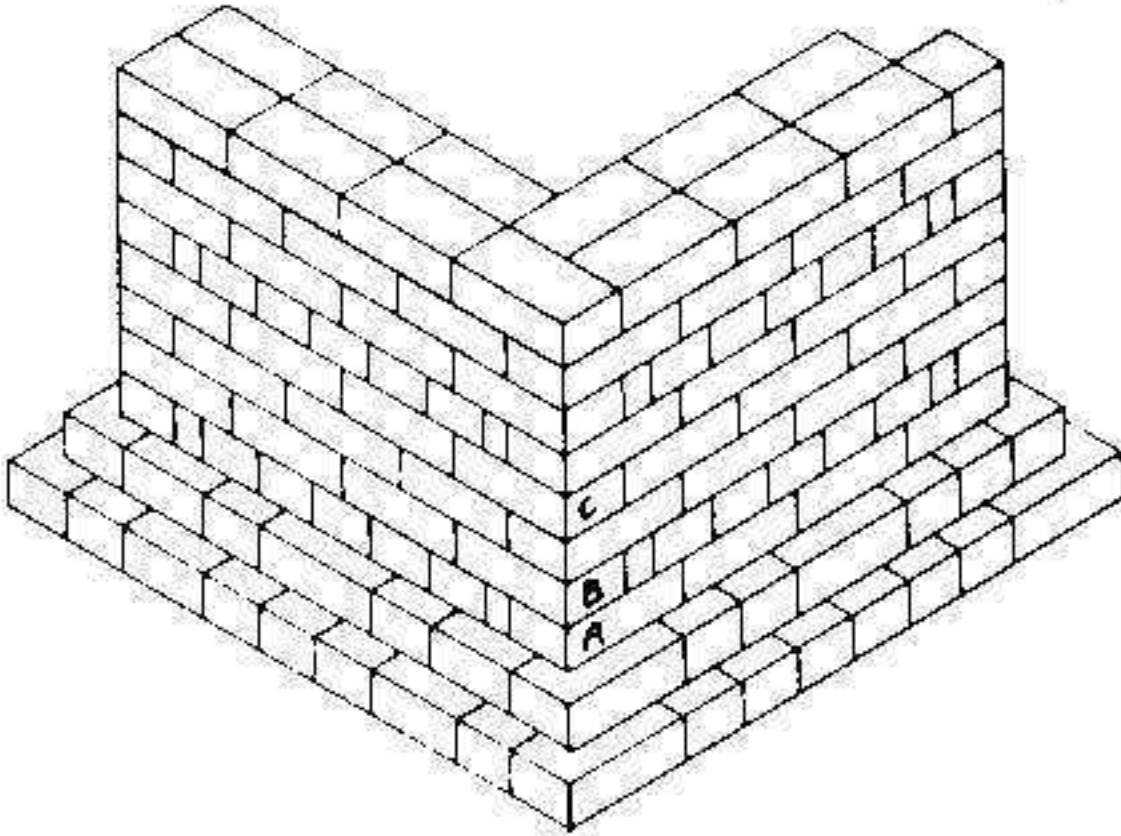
A: Critical Structural Details - Full Brick Wall Section
